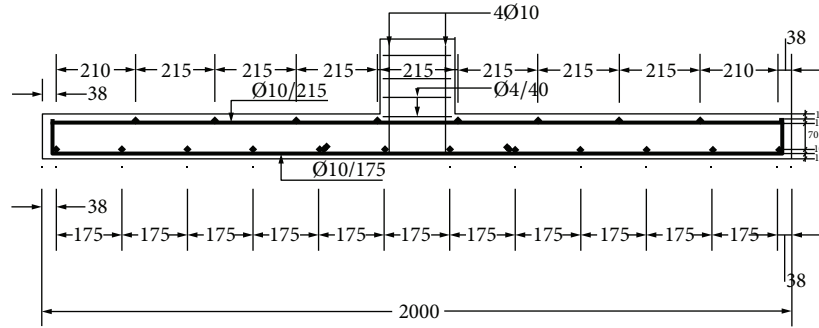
Arrangement of slab reinforcement (dimensions in mm) [33].
